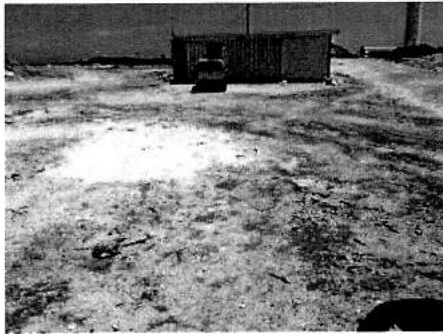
Hard ground and road surface on right requiring topsoil and aeration.
